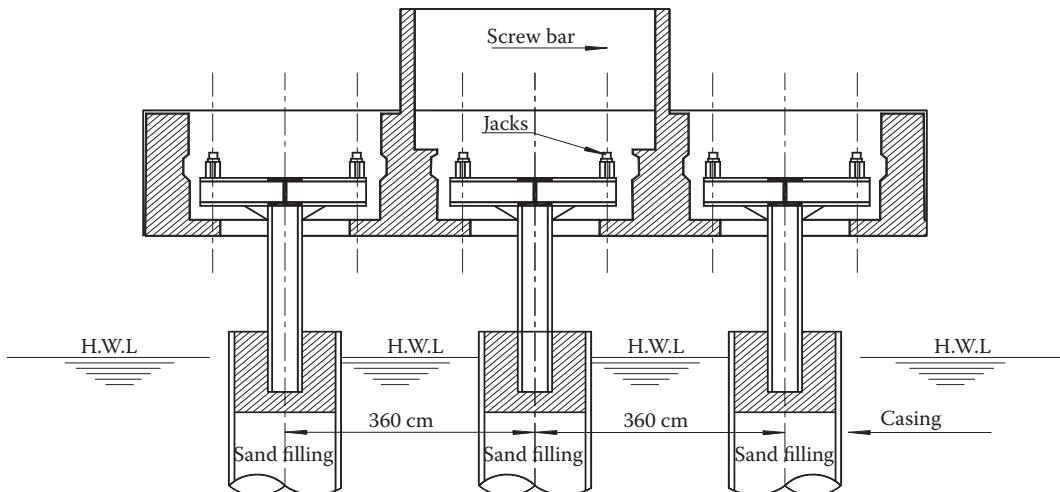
Lifting the pile cap, stripping off side and bottom formwork, and taking apart the temporary platform (step 16).
